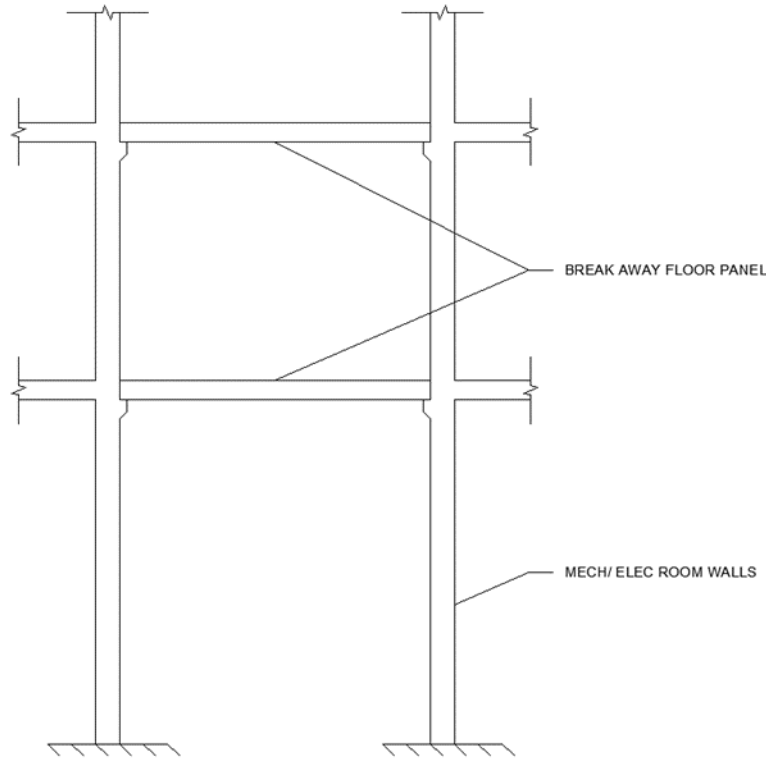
Mechanical/Electrical room break-away floor panels applied to all levels up to h_{max}
